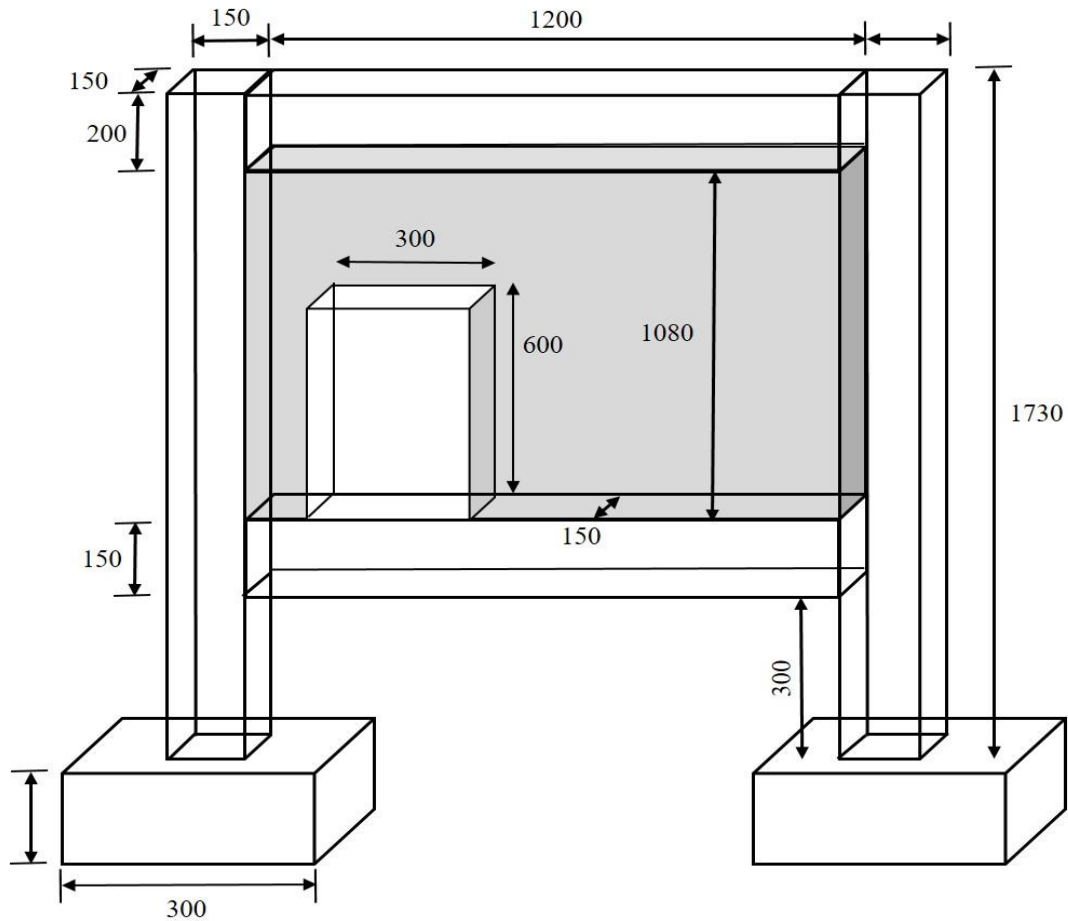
35: 2D frame with door opening (all dimensions are in mm)
